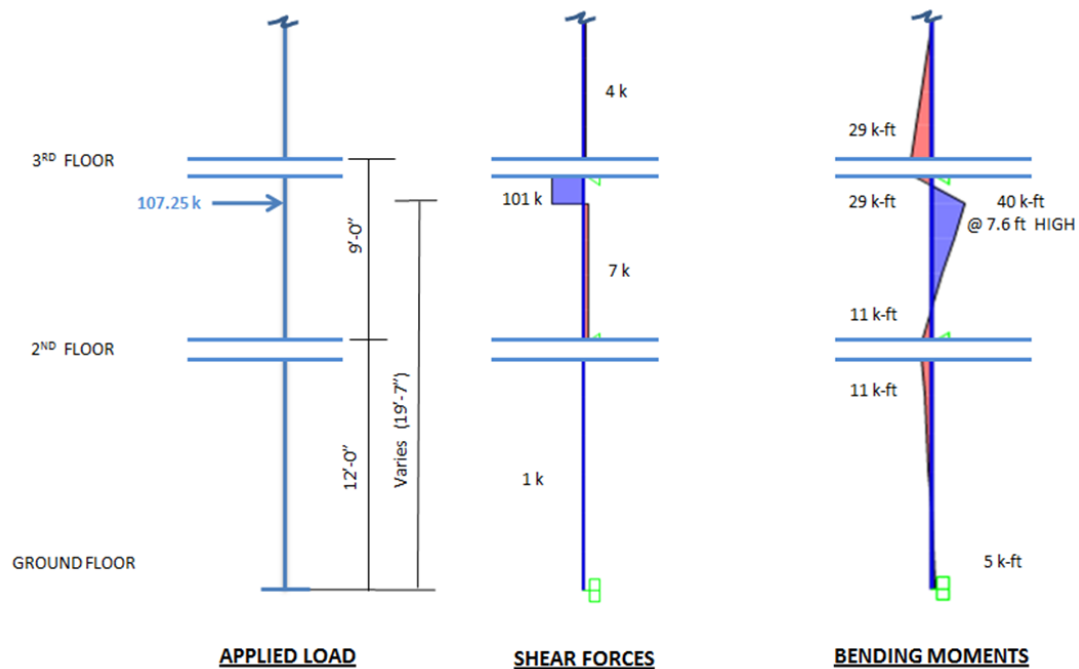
Impact load applied at d away from the end of column on the 2nd floor
